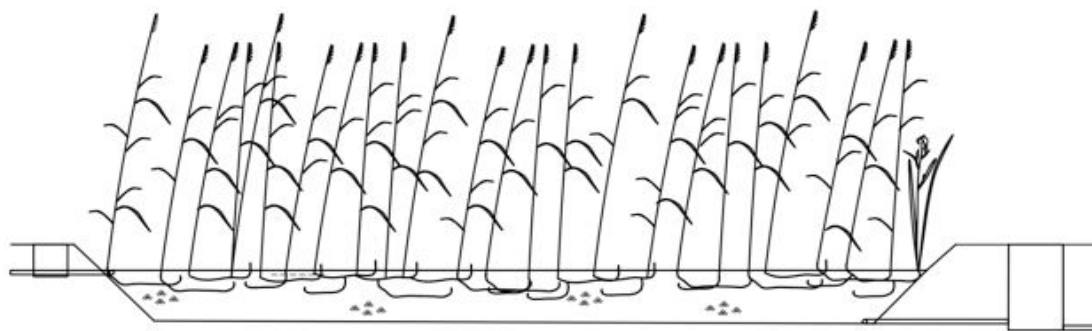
Newly planted wetland system for single dwelling, filled with clean water for planting and plant establishment.
